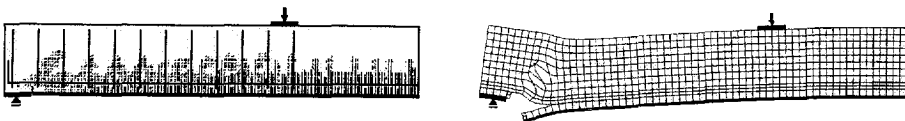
L50, stirrups: partially and fully open cracks and incremental displacements at maximum load (27.3 kN); failure by shear peeling crack
